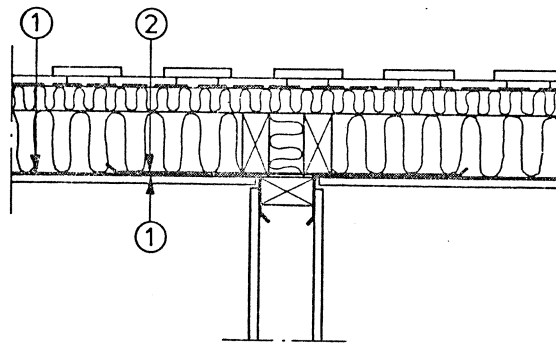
Horizontal section, gable wall - loadbearing partition wall
